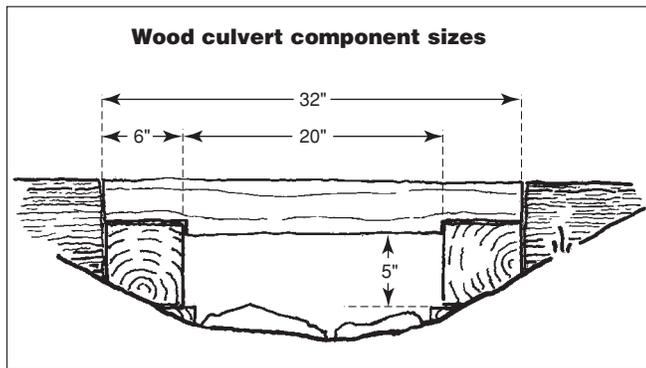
Minimum size recommendations for a wooden culvert designed to use standard timber sizes efficiently. Often larger culverts may be needed. This culvert has no constructed invert.
